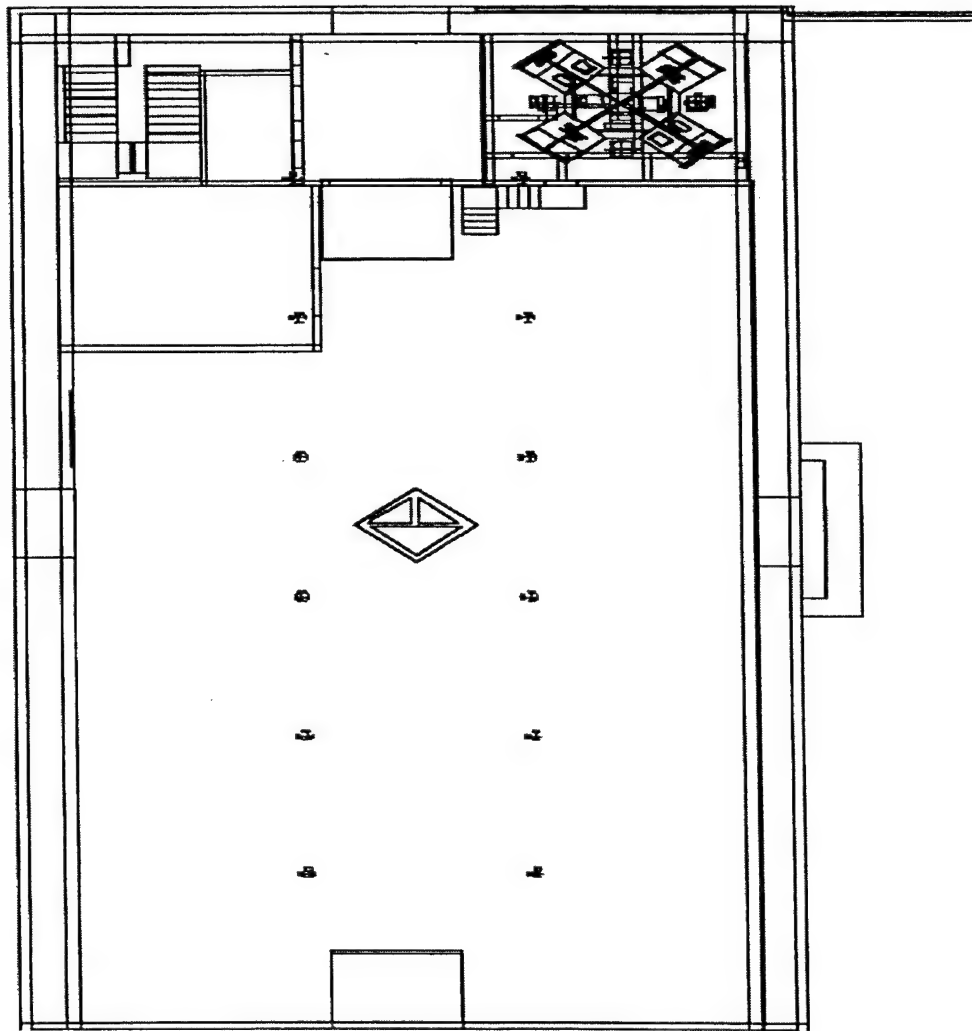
First Floor Layout Manufacturing & Prototyping Facility
